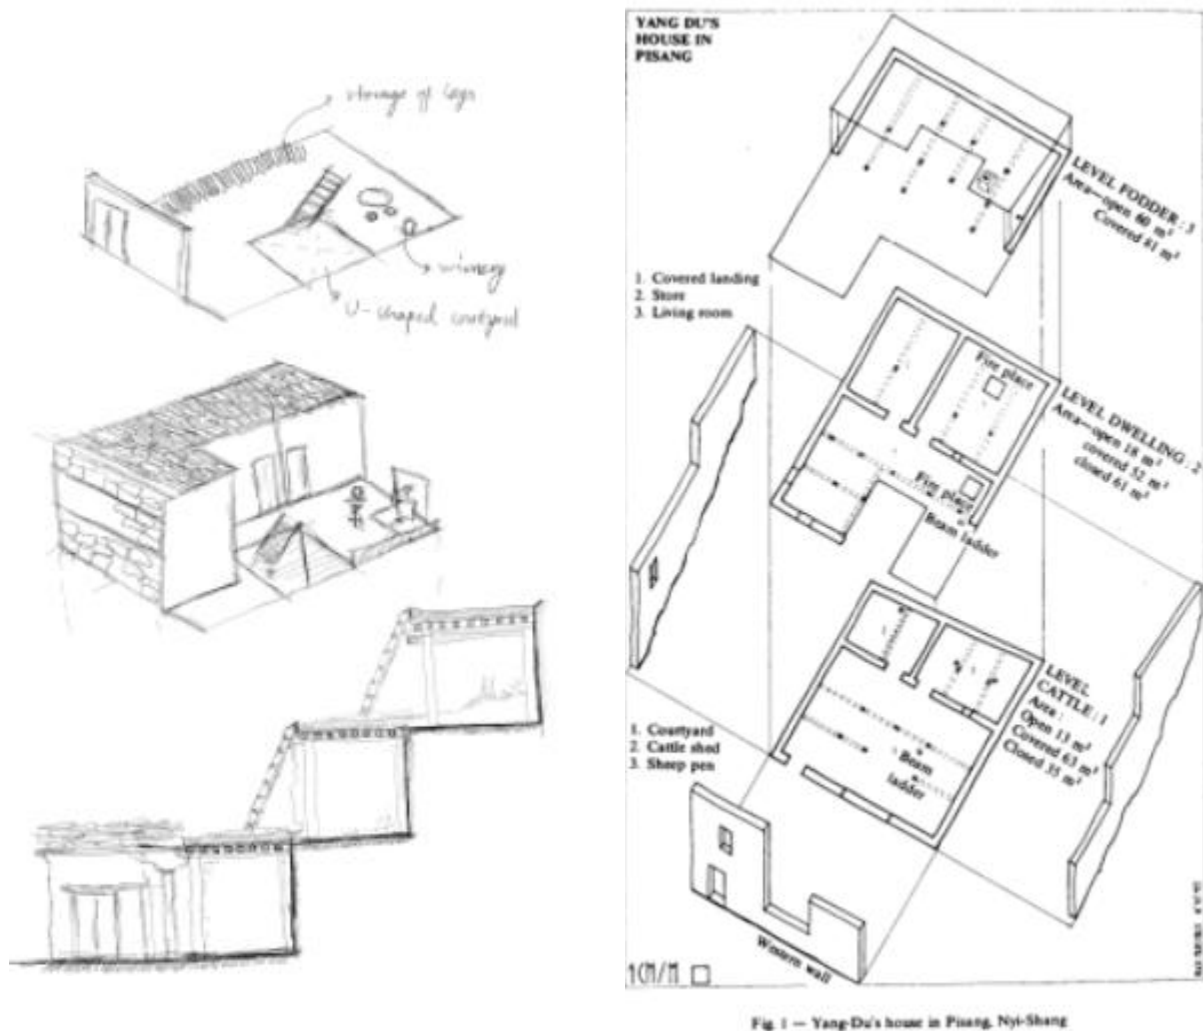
Floor Plan and Sectional Elevation of the Local Household in Bhraka.
